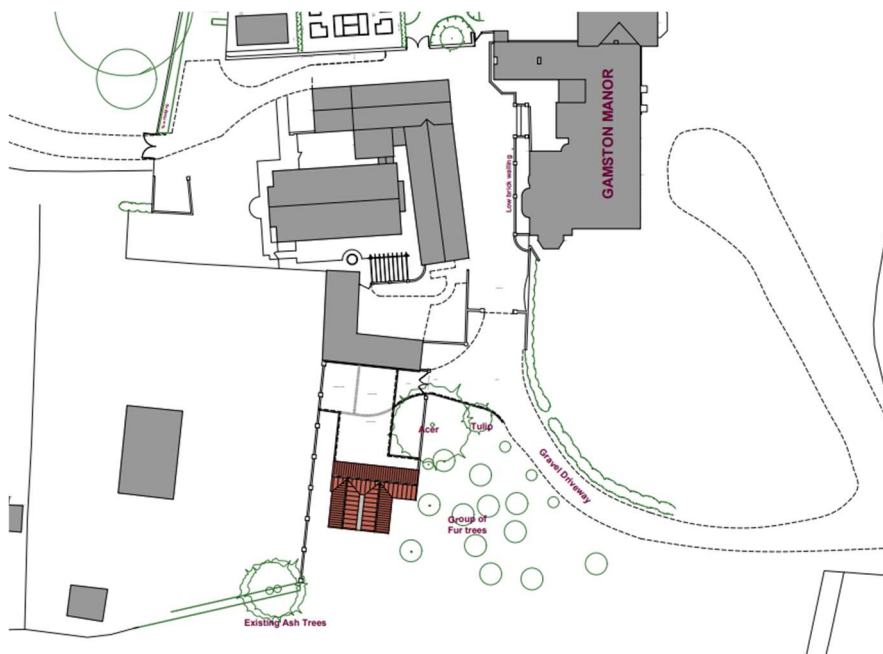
Extract from proposed site layout (Ryland Design Services Ltd).
